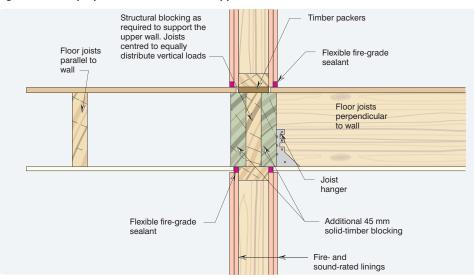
Joists perpendicular and parallel to single stud wall with timber blocks – FRL 60 minutes – elevation view.
